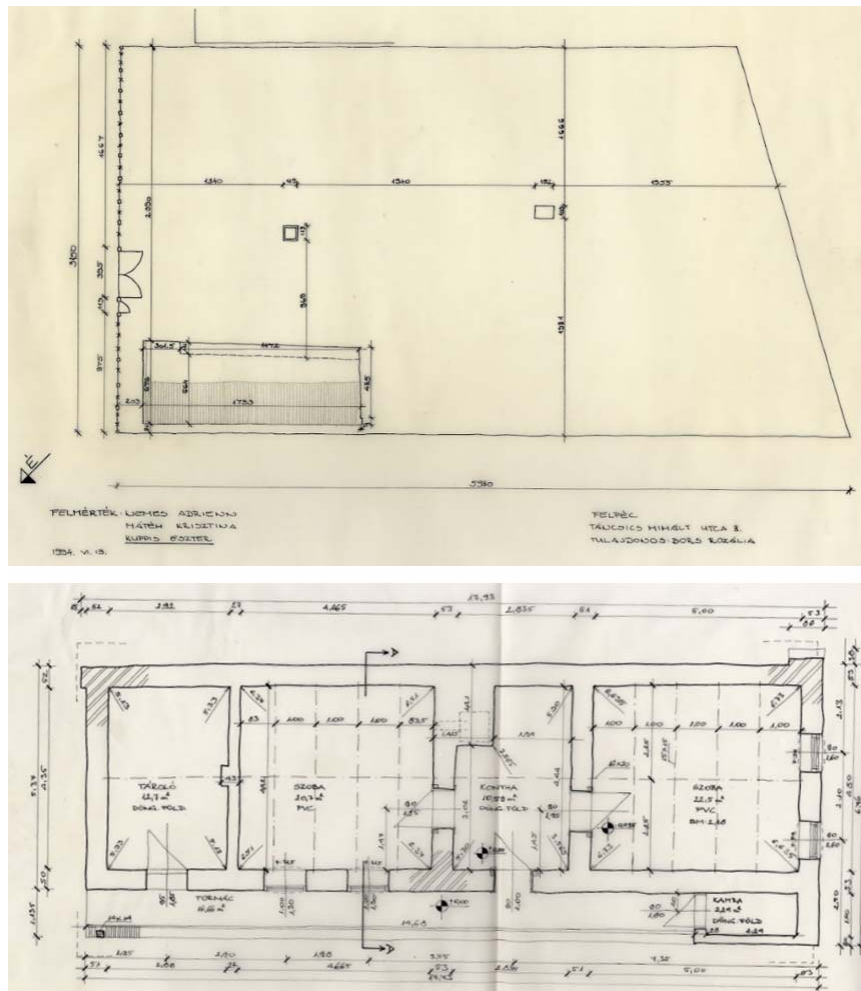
Site plan and ground plan. An earth wall (“swallow’s nest”), a brick wall and stone set in mud alternate in the structure. We also find a walled-in door in the atrium. The site plan only shows the fencing of the front garden.
